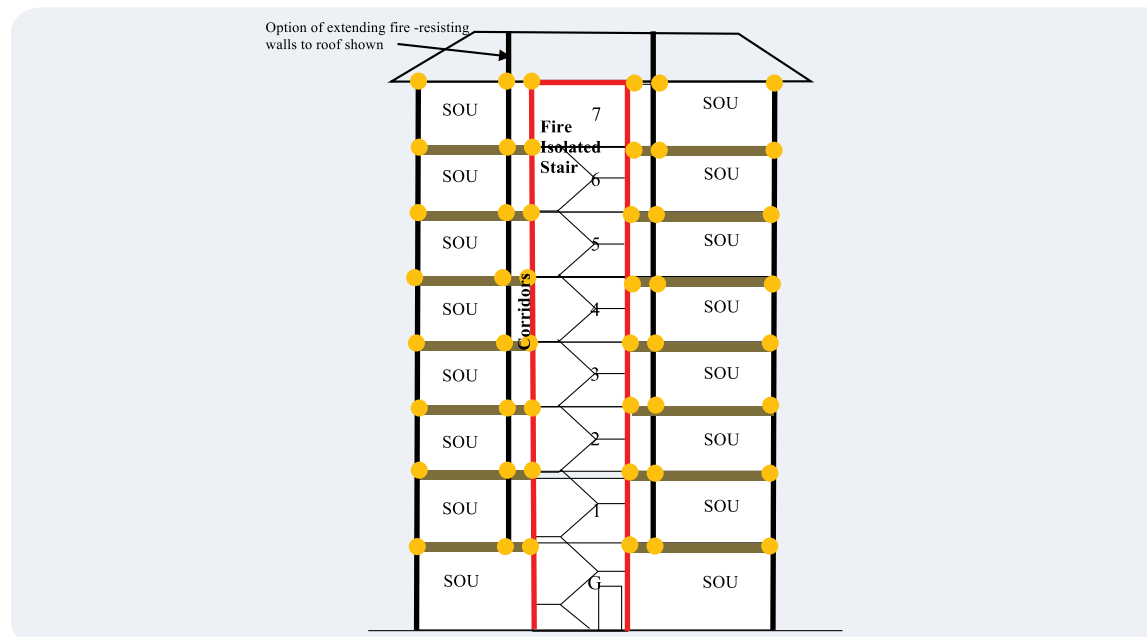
Vertical section of an apartment building showing typical cavity barrier positions.
